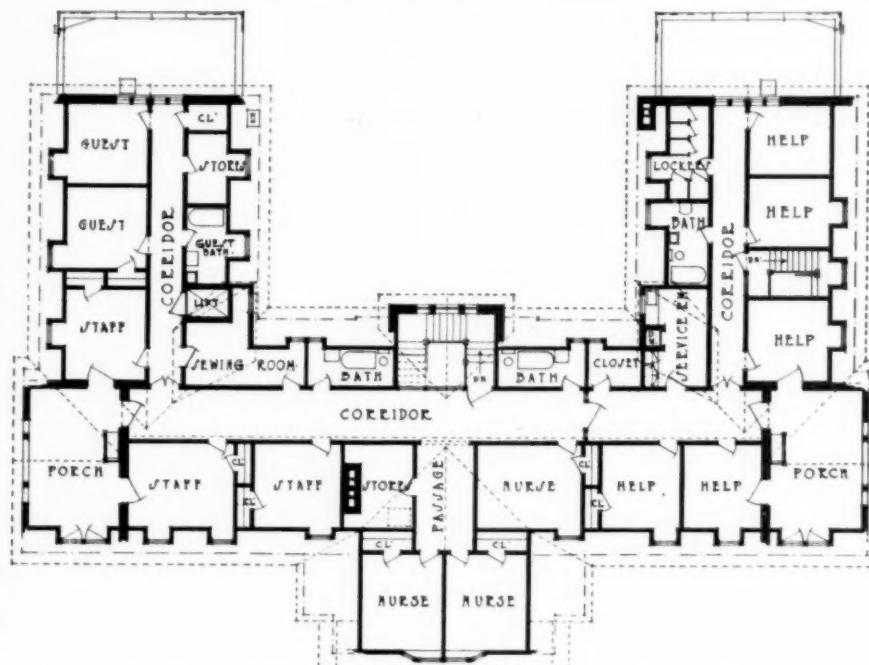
Nopeming Hospital for Tuberculosis. Administration building. Third floor plan.
